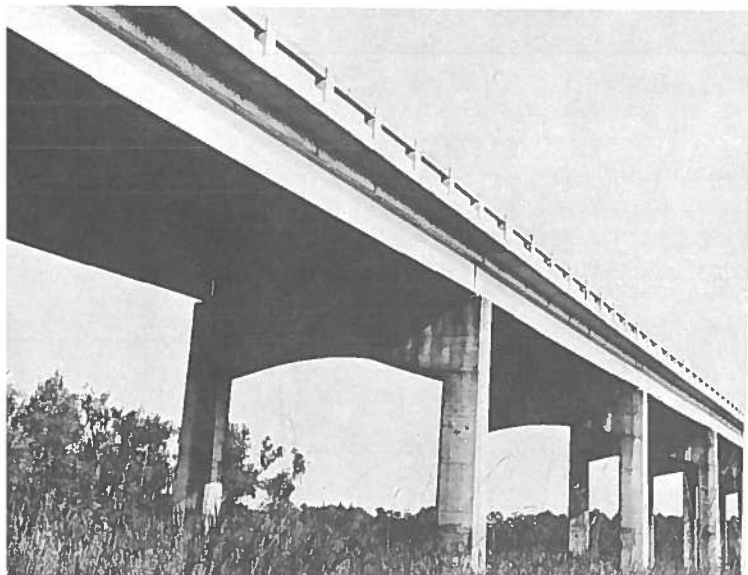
COMPOSITE WIDE FLANGE BEAM BRIDGE
